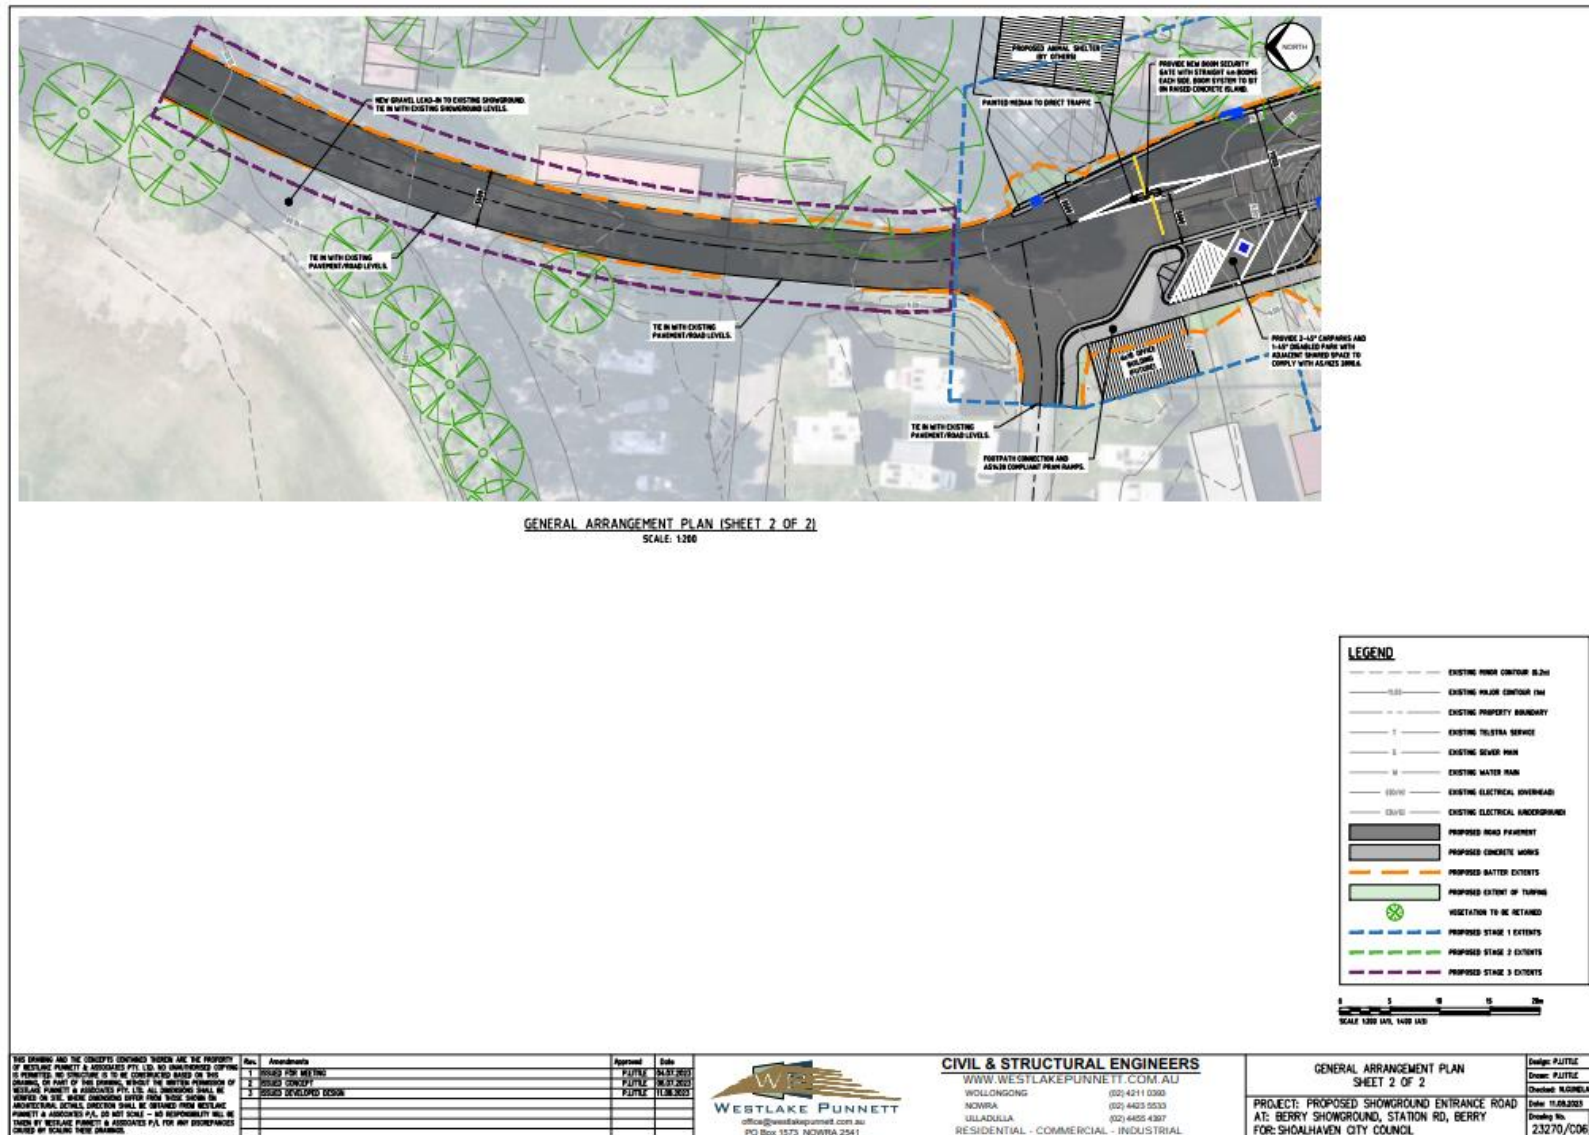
General Arrangement - Sheet 2 (Westlake Punnett and Associates Civil and Structural Engineers, 2023)
